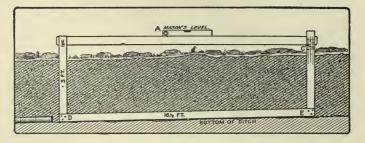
Grading frame used in leveling the bottom of tile ditches.
